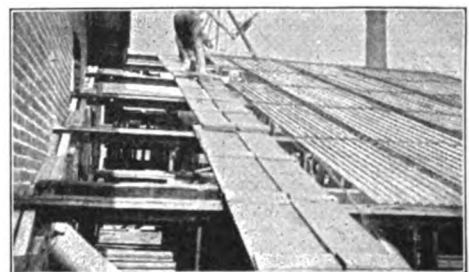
DETAILS SHOWING ROOF CONSTRUCTION OF CORRUGATED WIRE GLASS
